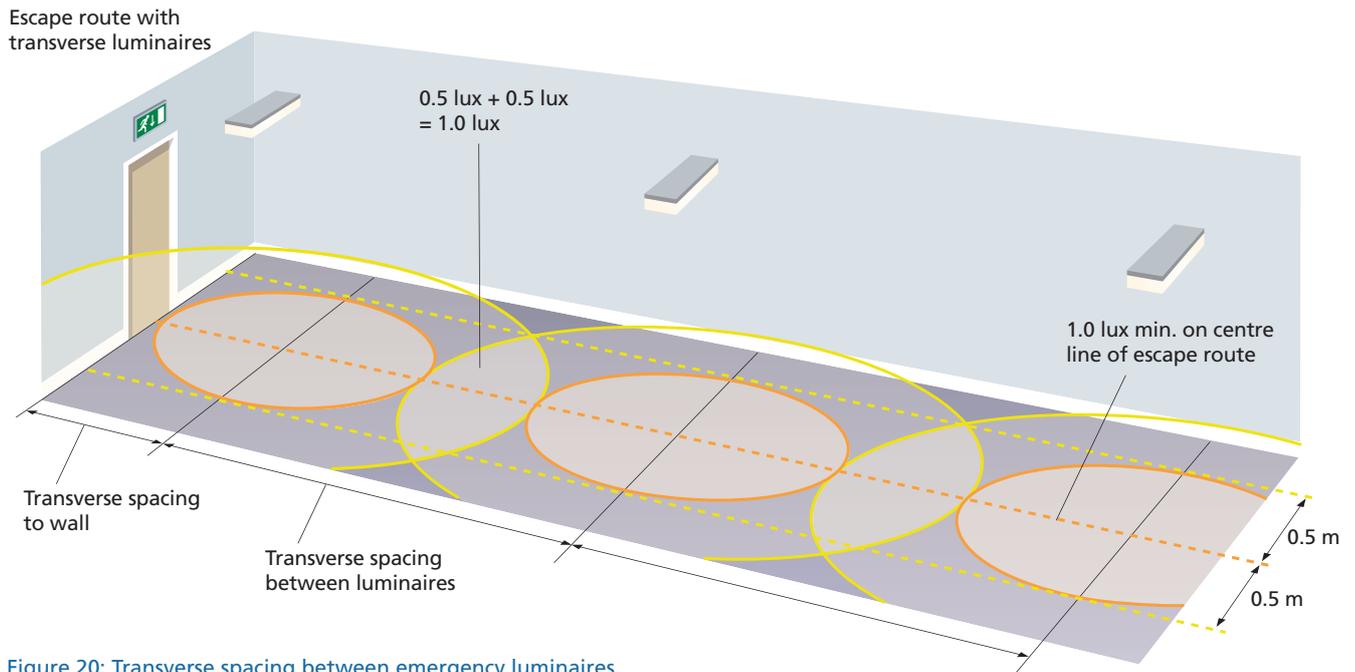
Transverse spacing between emergency luminaires, within a 2 m wide corridor
